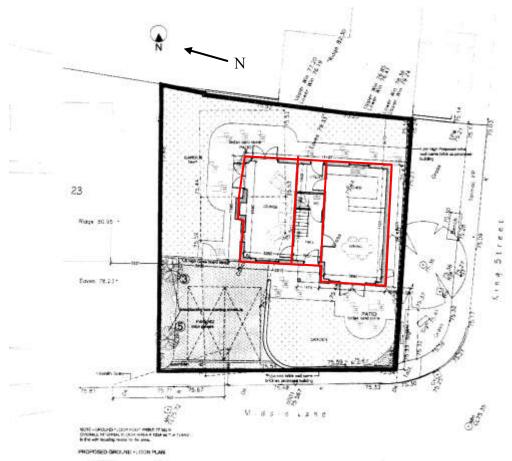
Site location and foundation trenches Trenches shown in red. Plan supplied by client
